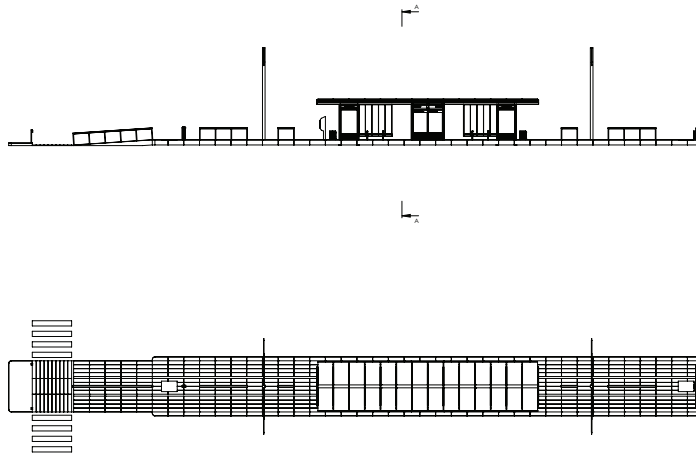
Plan and section, Nørreport tram station (Aarhus Letbane)
